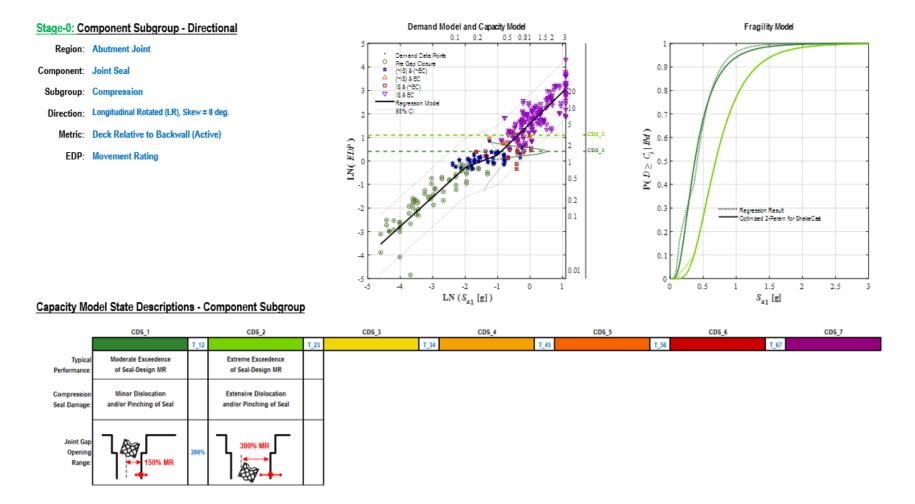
Stage-0: Abutment joint seal damage with compression seal
